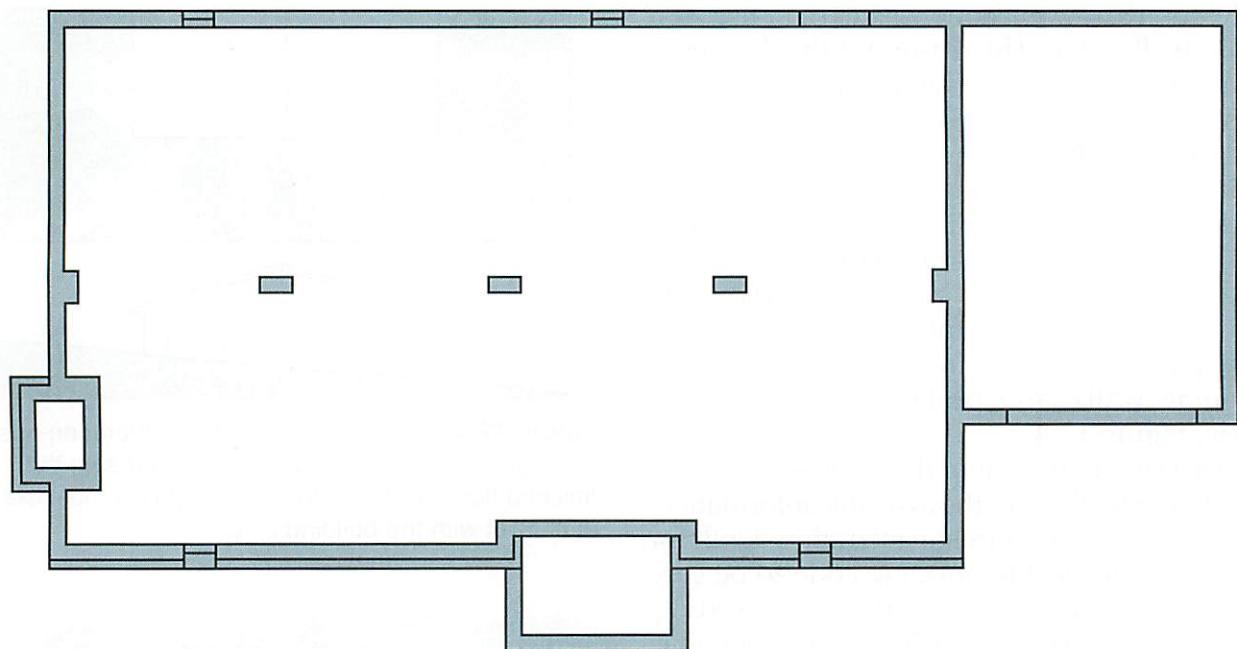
A partially completed foundation plan that shows the foundation walls, piers, pilasters, and vent openings.
